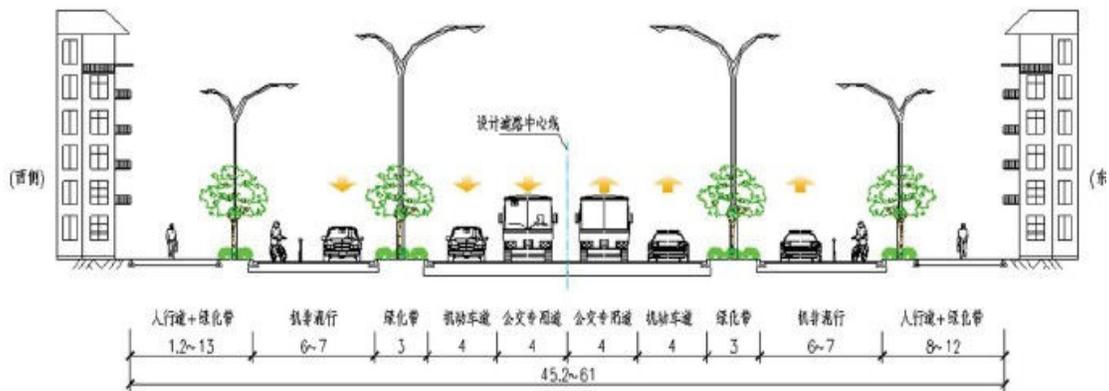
Profile design for North Outer Ring Road □ Taihang Street
